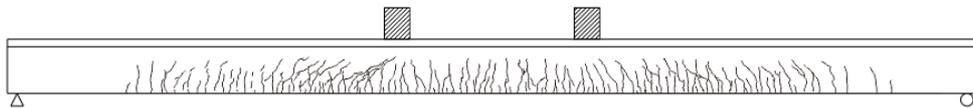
Crack pattern of Gunsunggang (when termination)
